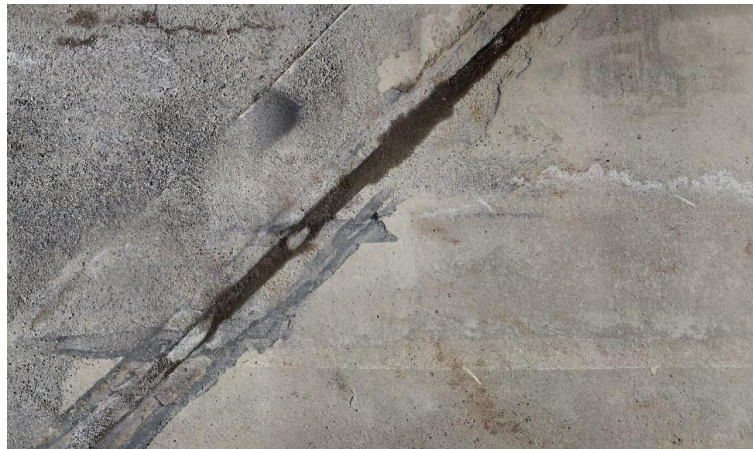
Image of a deck section around the joint of a bridge over Pohatcong River, Pohatcong Township, New Jersey.
